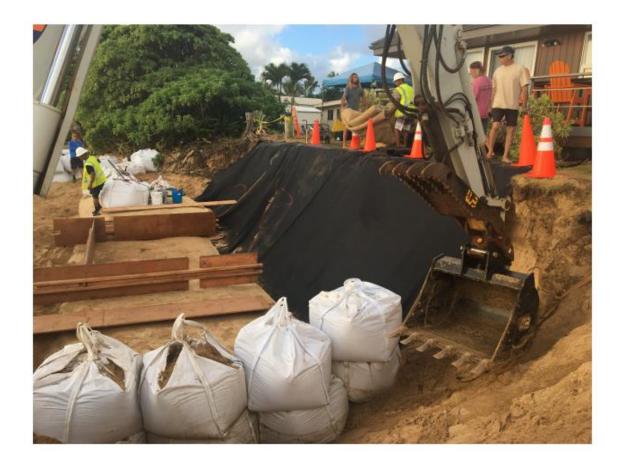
Sandbag wall being constructed and location of the burials are under the black cloth
